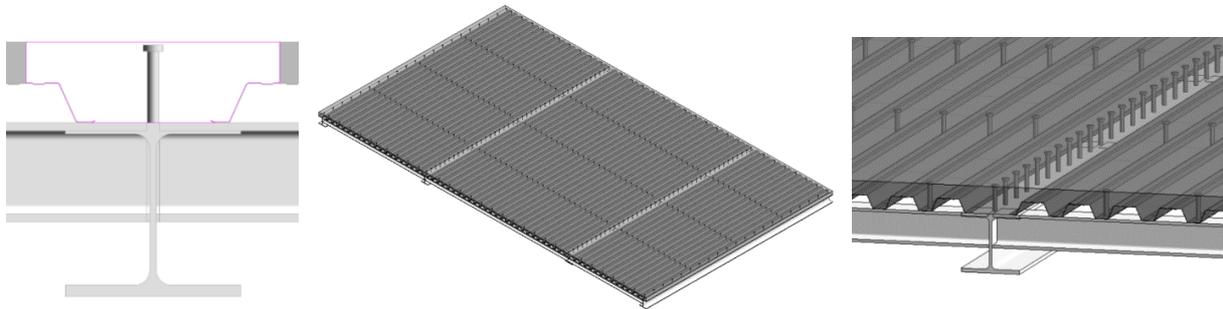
Modeling of the profiled steel sheeting, concrete layer and shear connectors.
